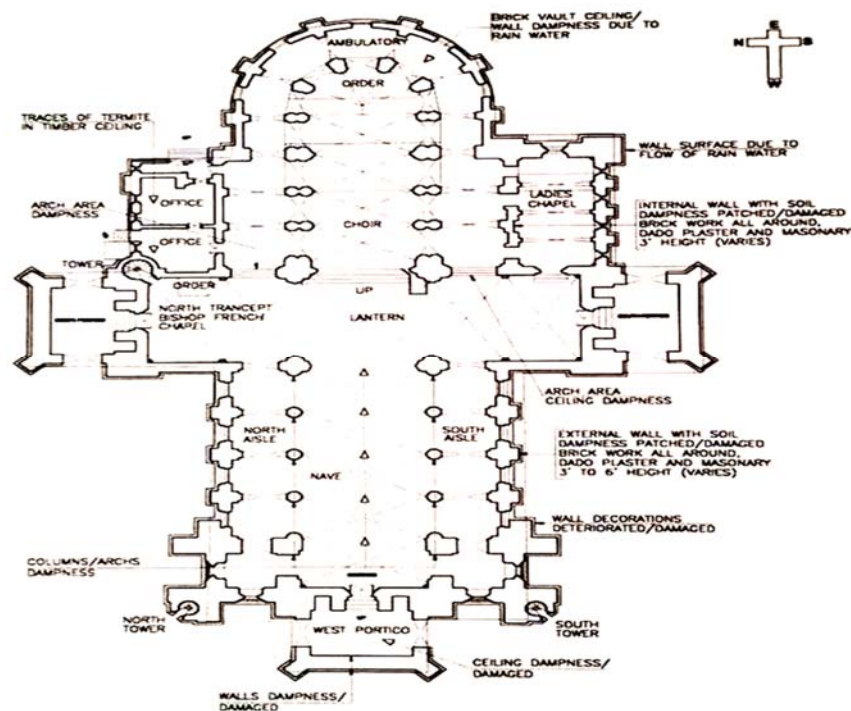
Plan of Cathedral Church Resurrection, Lahore 1878. Source: *Report for Renovation Works by Civil and Urban Engineers Feb. 2002
